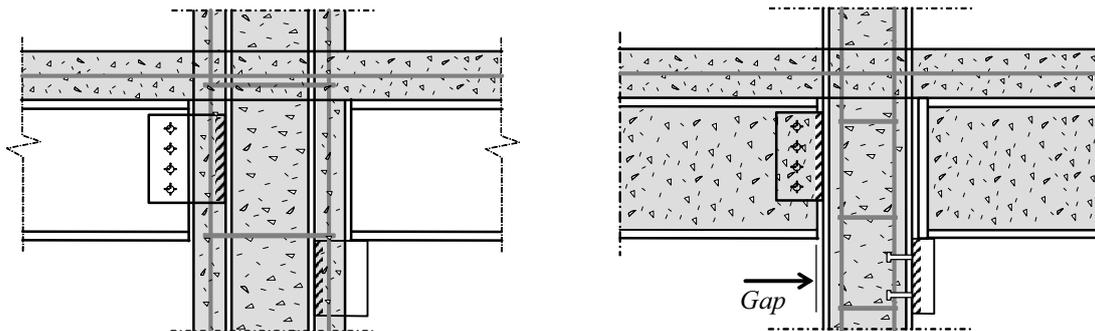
Joints to (a) concrete-encased column, (b) concrete-infilled column.
